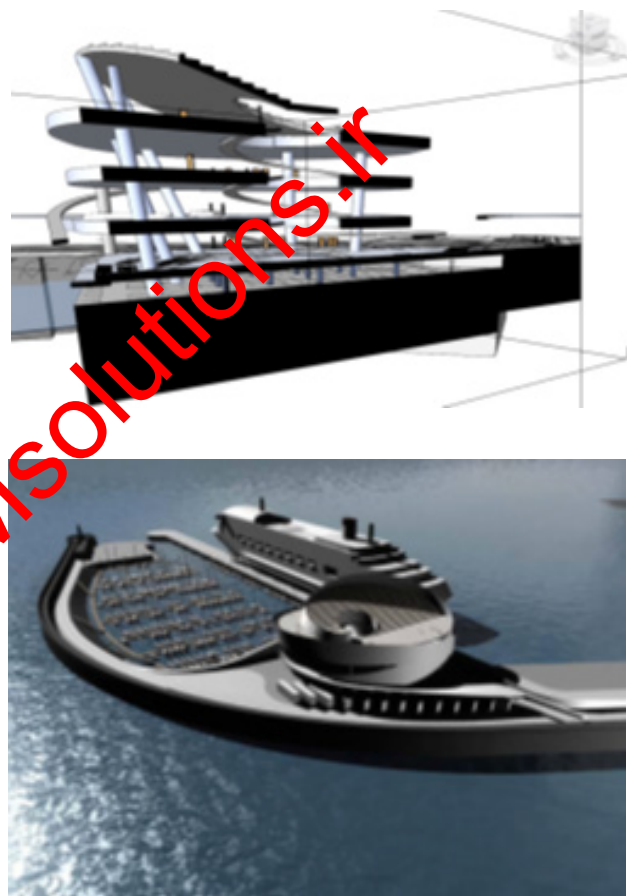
a, b) – Complex shape modeling – Leixões Cruise Terminal Building
